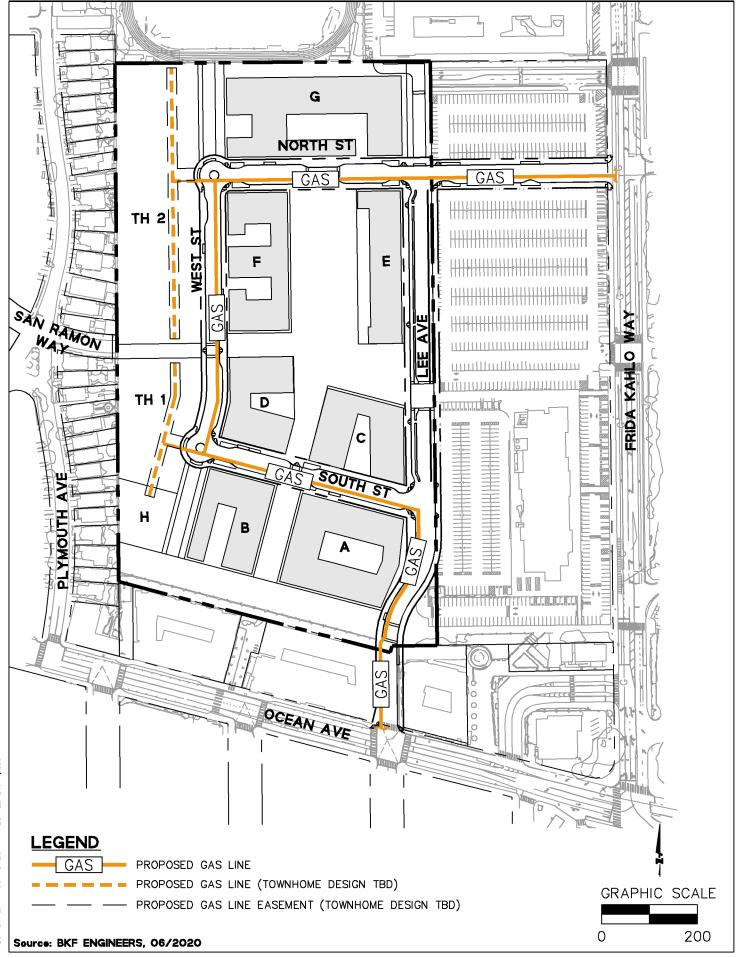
B - PROPOSED JOINT TRENCH SYSTEM (OPTION 2 - PG&E)
